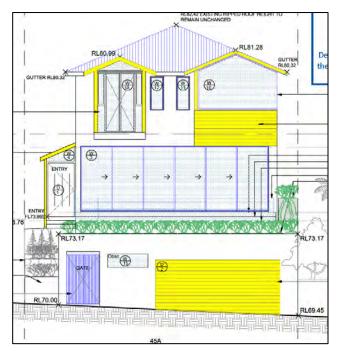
Approved front façade under DA-103/2021 at 45 Military Road.
